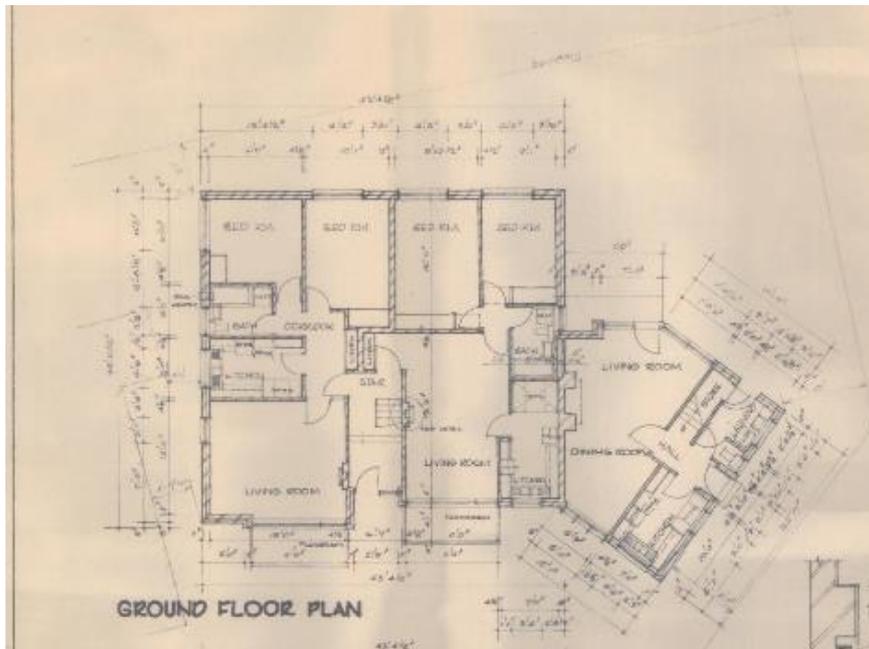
Ground floor plan of the west block. (Source: City of Boroondara)
